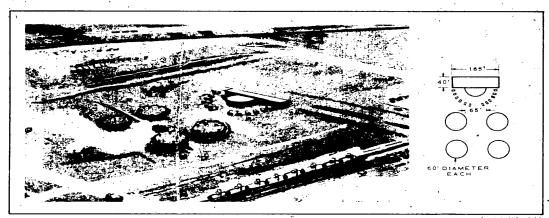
PLAN AND PERSPECTIVE VIEWS OF COMPLETED FUEL STORAGE BLENDING, AND CONTROL STATION, TYPE 3. CHENG-TU AIRCRAFT ENGINE PLANT.
